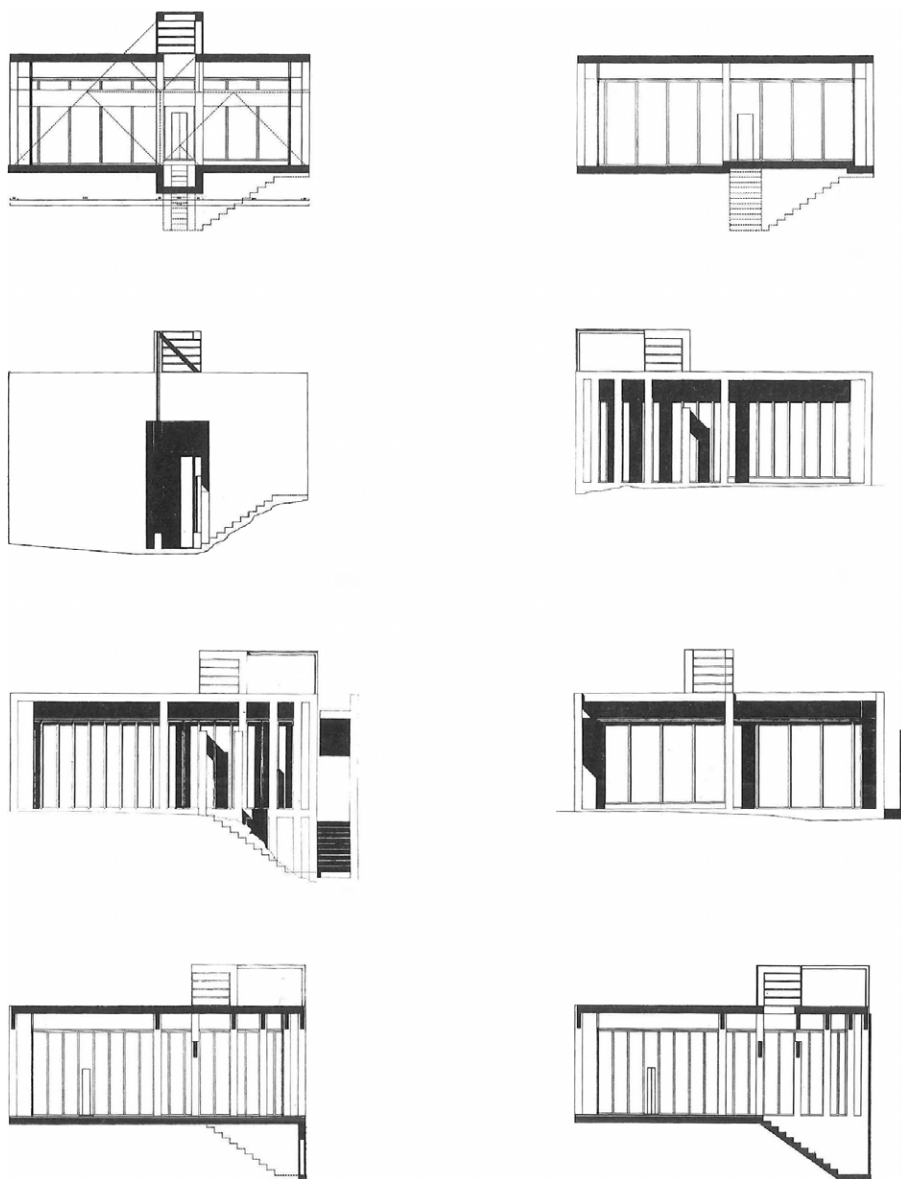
From top to bottom, left to right: Sections; Façades.
